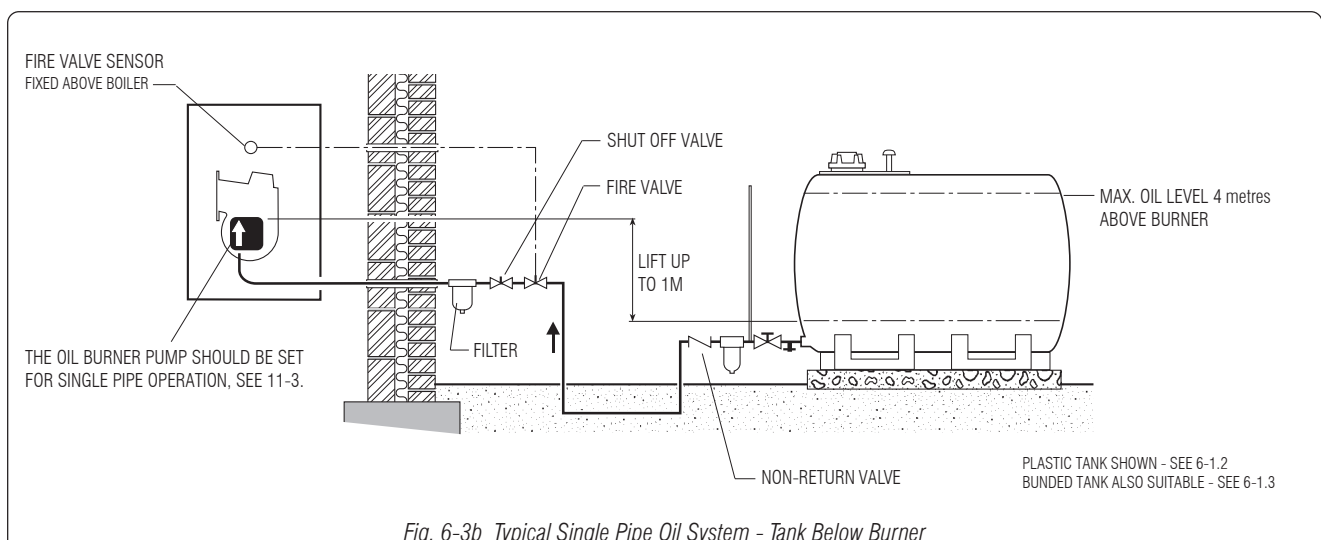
Typical Single Pipe Oil System - Tank Below Burner
